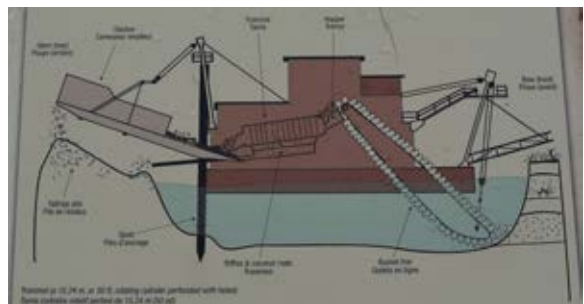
Typical layout of a Klondike dredge. From arrivedeh.com.
